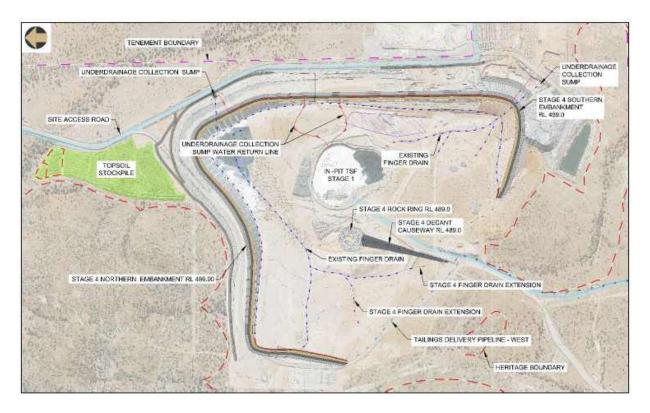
IWLTSF Stage 2, 3 and 4 Underdrainage System Layout (REC, 2025)
